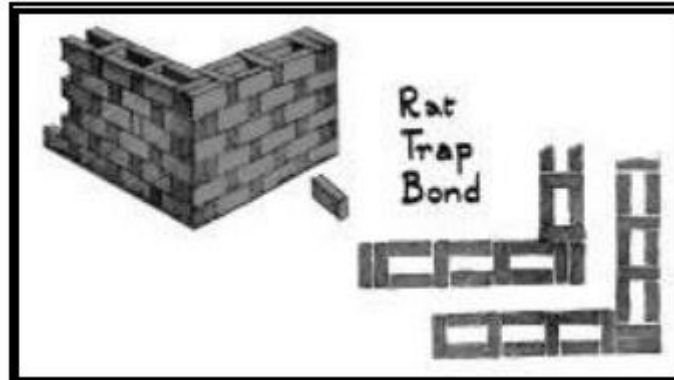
Rat Trap bond wall.(source: www.civilindia.in)
